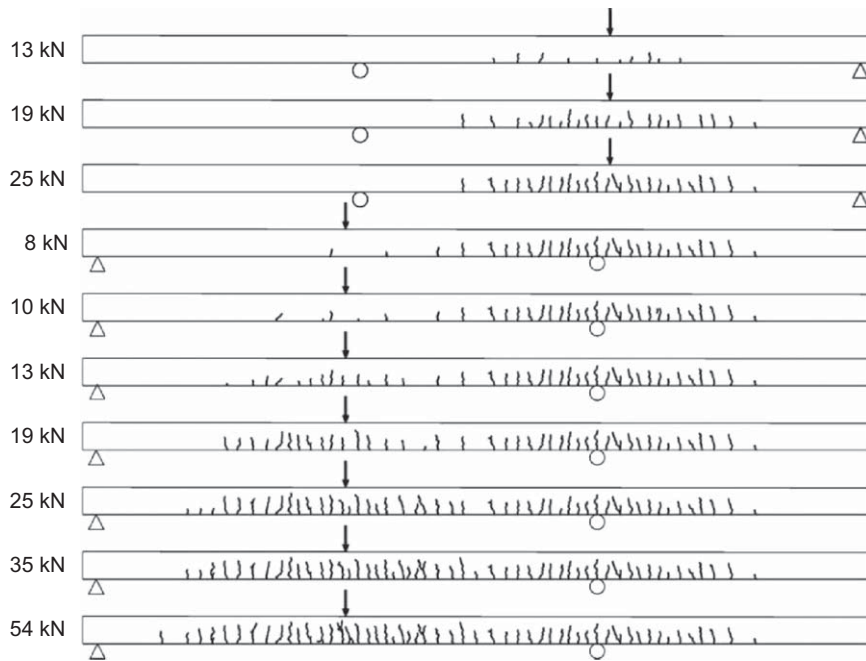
Reinforced concrete beam: observed cracks (load steps 3–12).
